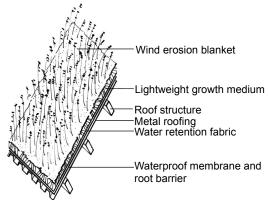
Extensive roof garden with thermoplastic membrane (example of proprietary system)
